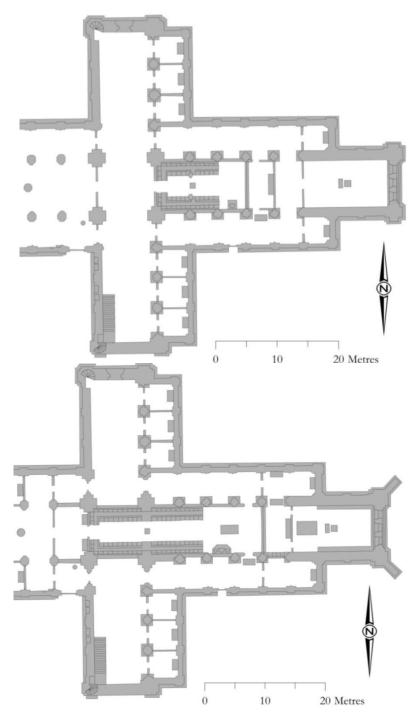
The layout of the east end at St Andrews Cathedral. Above: A conjectural reconstruction prior to reconstruction the work between 1393 and 1443. Below: The changes made to the internal organisation of space in the reconstruction. (Redrawn by the author after McRoberts 1976: 179).
